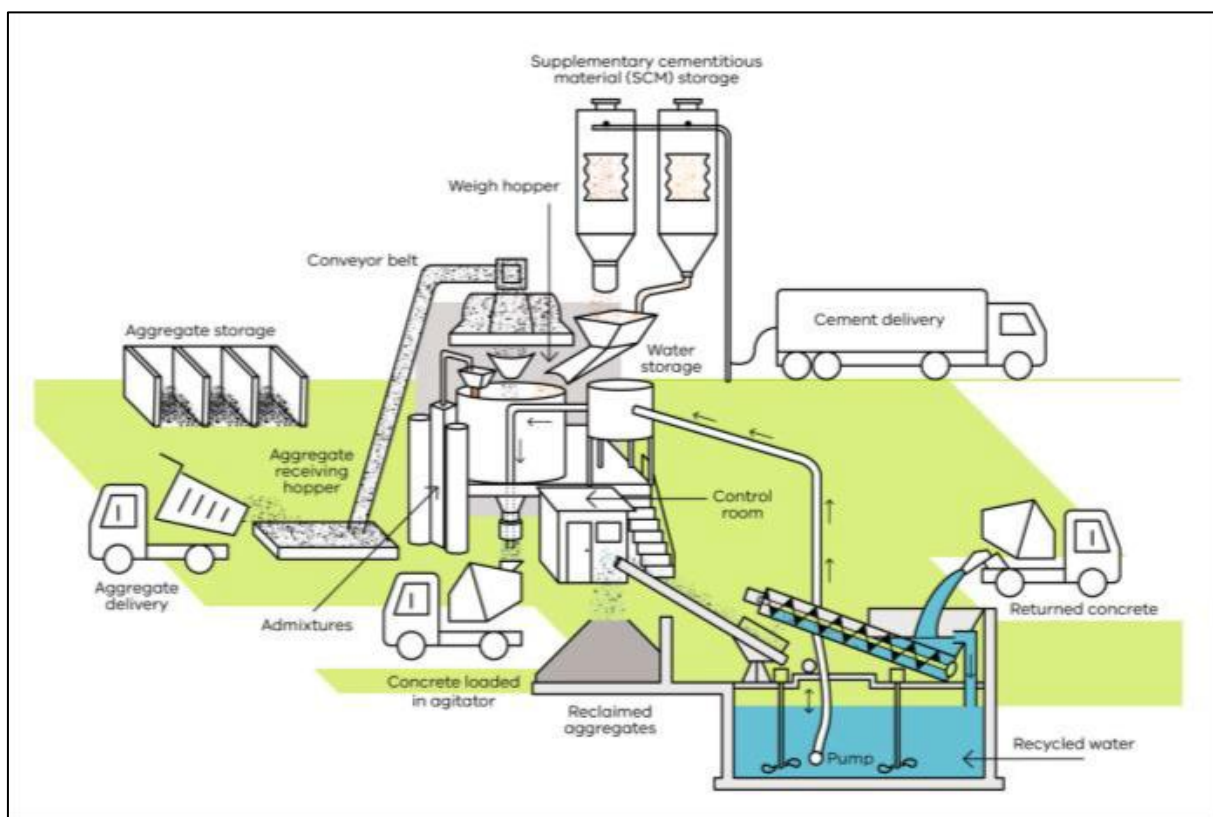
Typical batch plant components (Source EPA Victoria)
